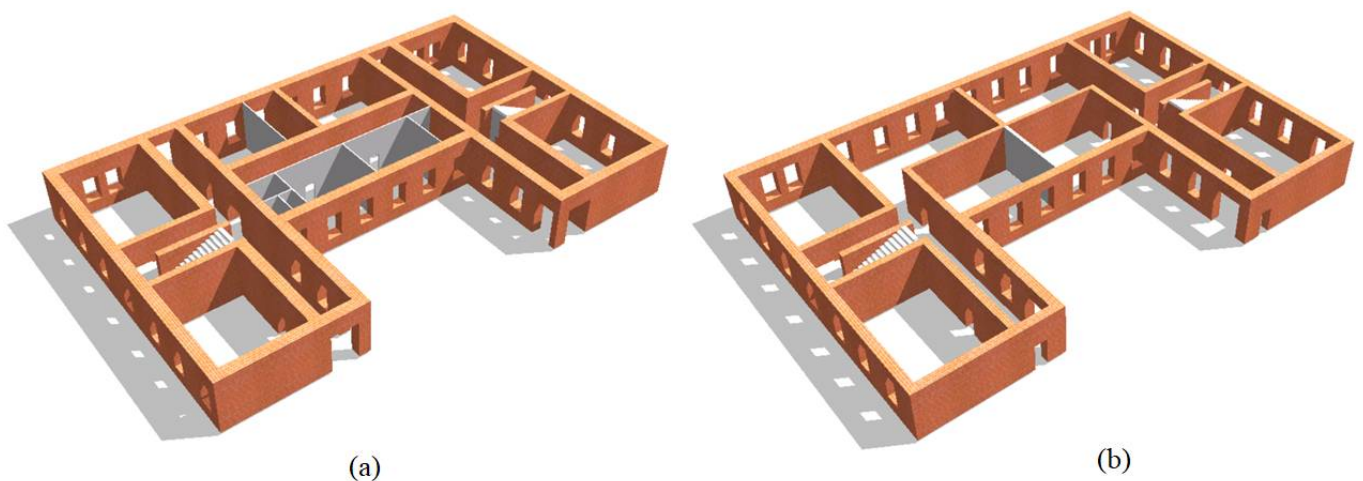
3D models of: (a) the ground floor; (b) the first floor.
